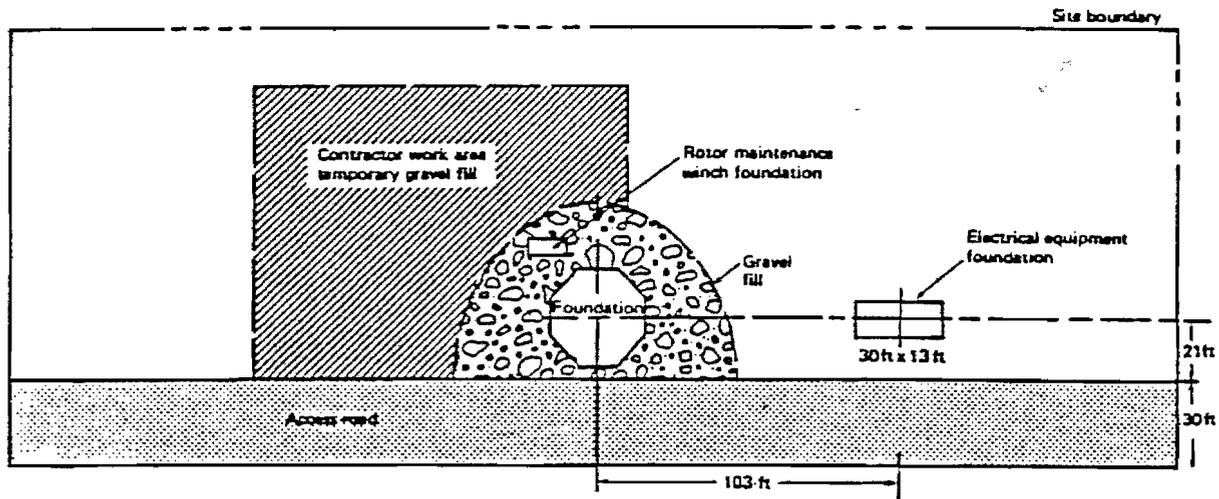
Wind Turbine System Conceptual Site Plan
